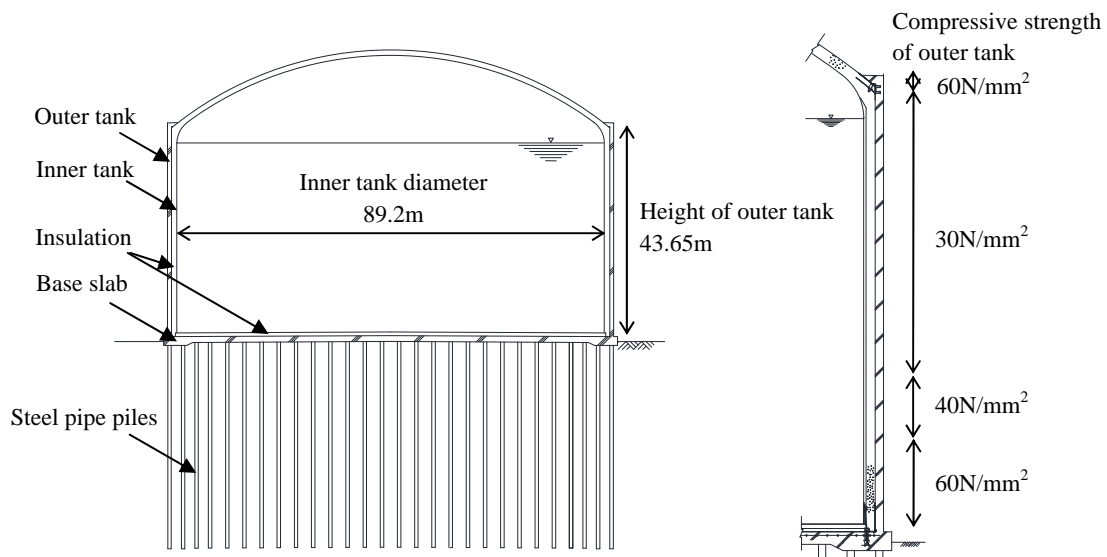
The Structure of LNG aboveground storage with prestressed concrete outer tank
